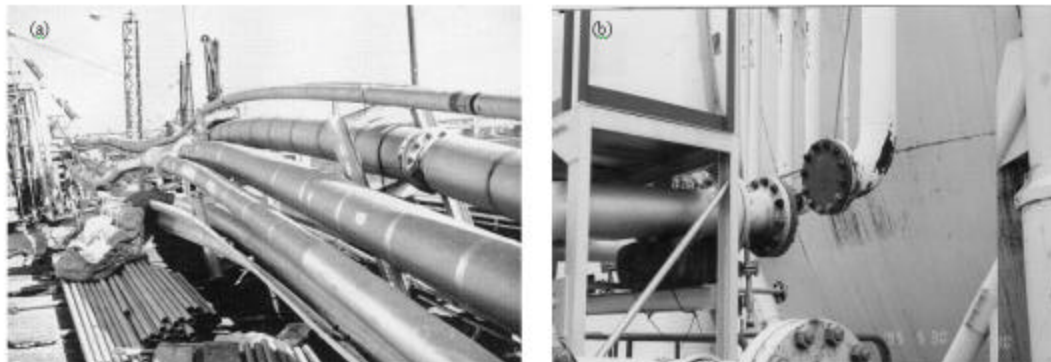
(a, b): Deformation and damages of piping and pipe-ways (Suzuki, 2008)
